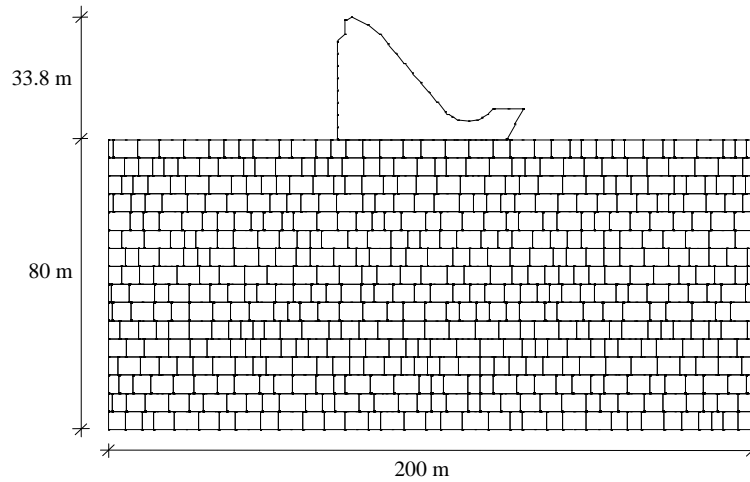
Model of a concrete gravity dam on a jointed rock foundation.
